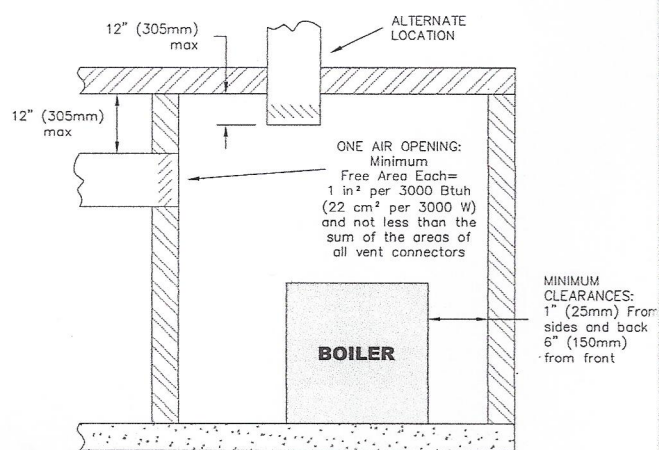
Air Openings - All Air from Outdoors through One Opening
